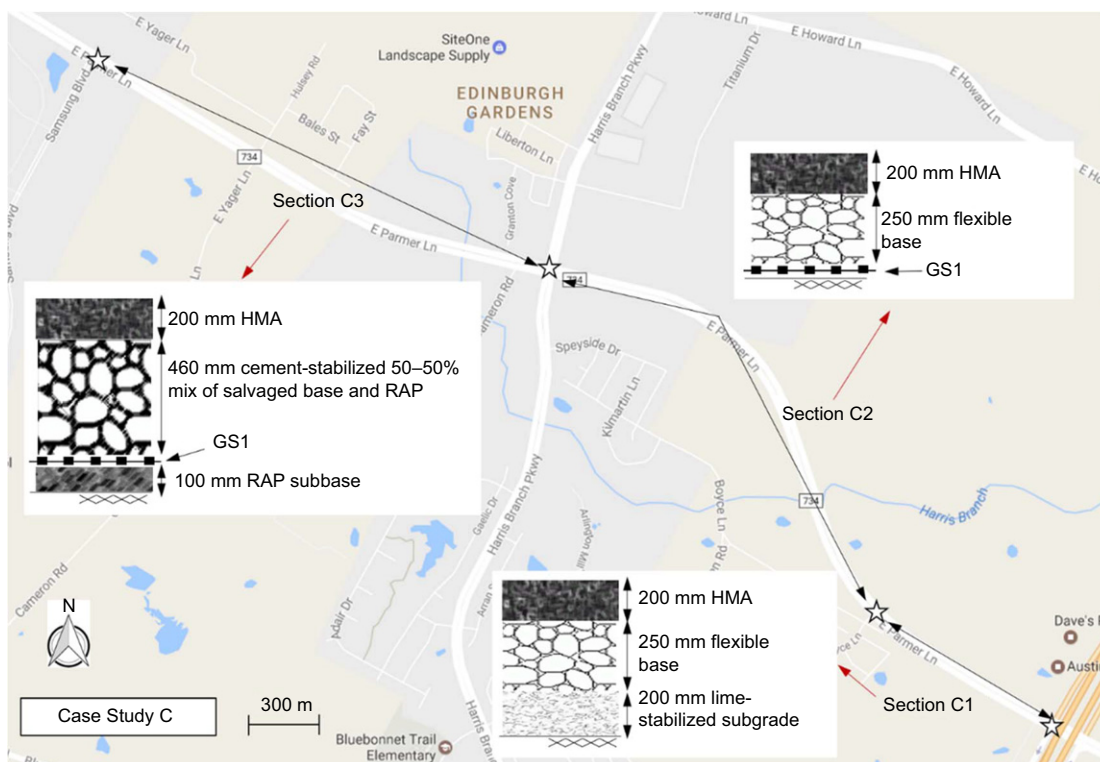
Layout of FM734 test sections and associated road profiles (Case Study C)
